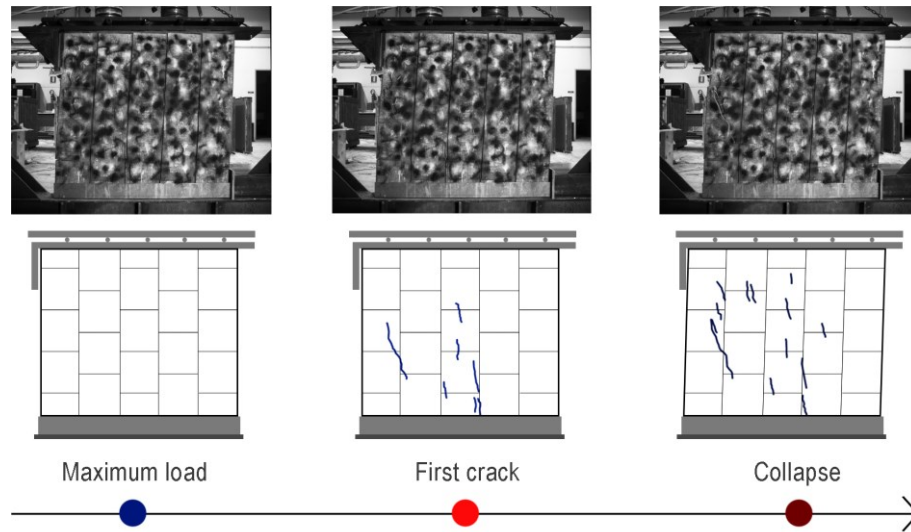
History of the cracking pattern of the wallette under a shear and precompression load.
